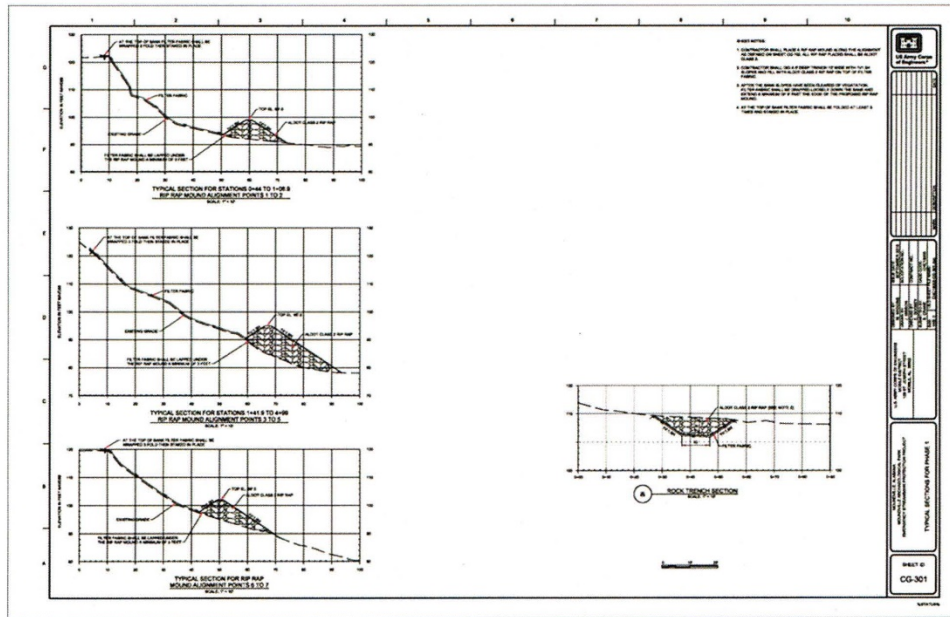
Typical cross-sections of the project. Note the rock trench cross section on the bottom right.
